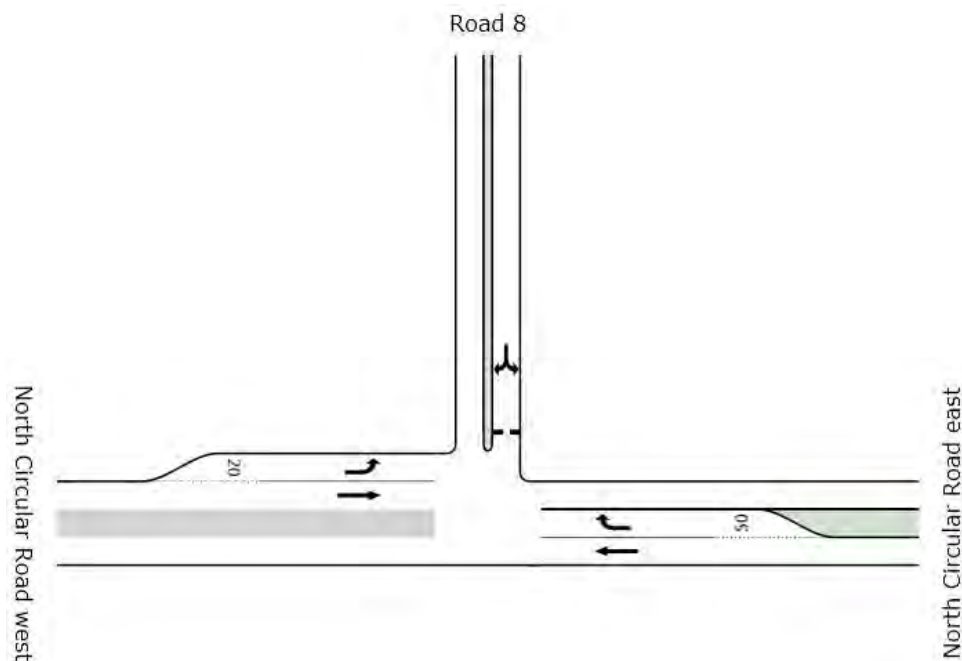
Preferred intersection layout (North Circular Road and Road 8)
